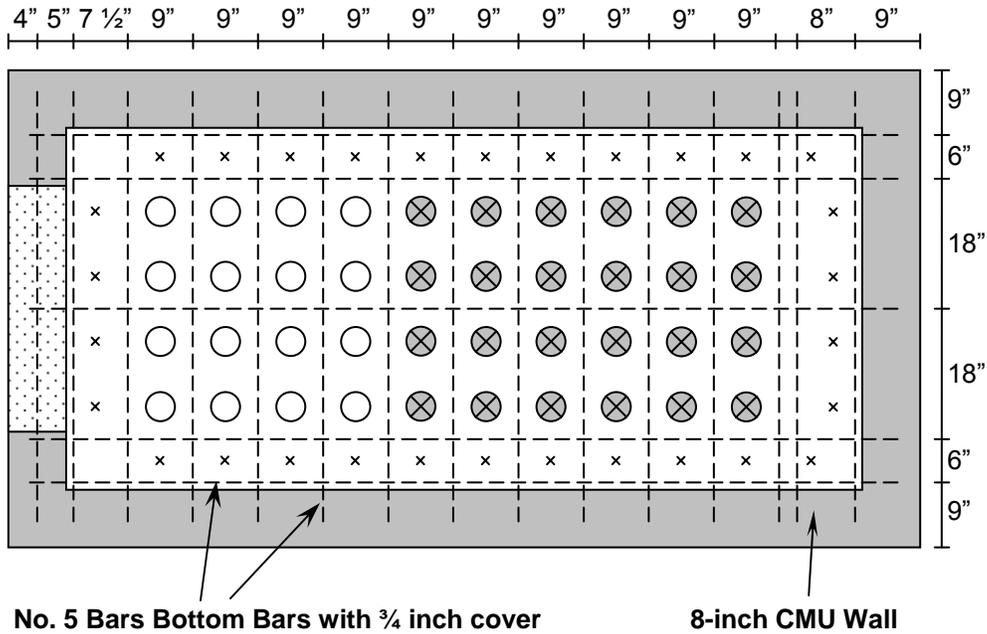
Steel reinforcement layout of the mock bridge deck
